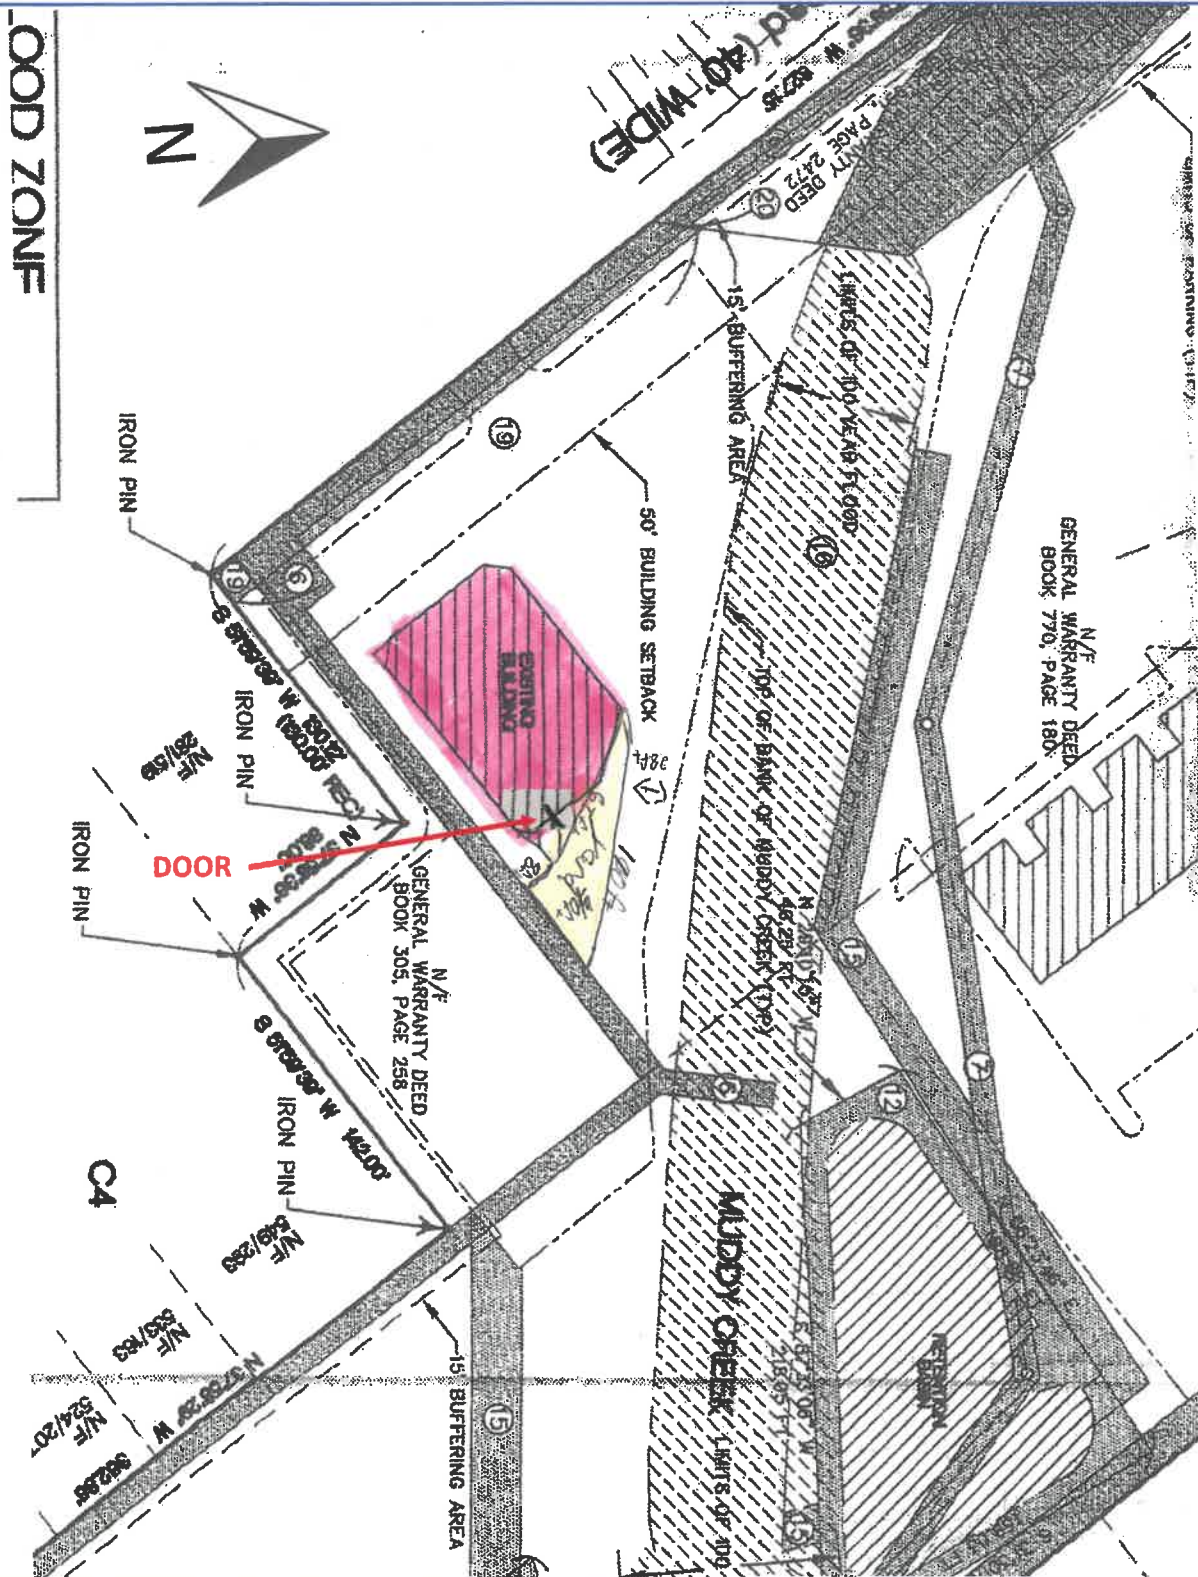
EXHIBIT B: PLAT WITH YARD AND NEW DOOR LOCATION SKETCH
